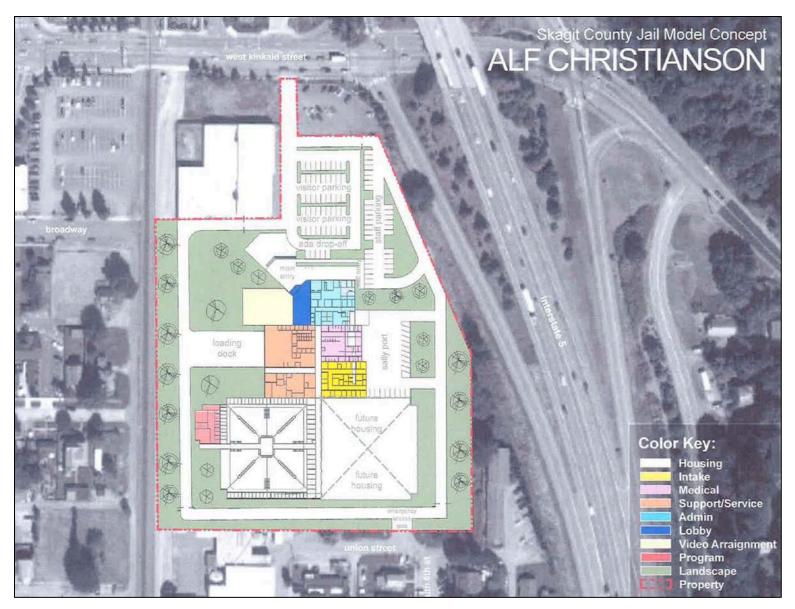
A proposed layout for the jail if built at the Alf Christianson Properties.
